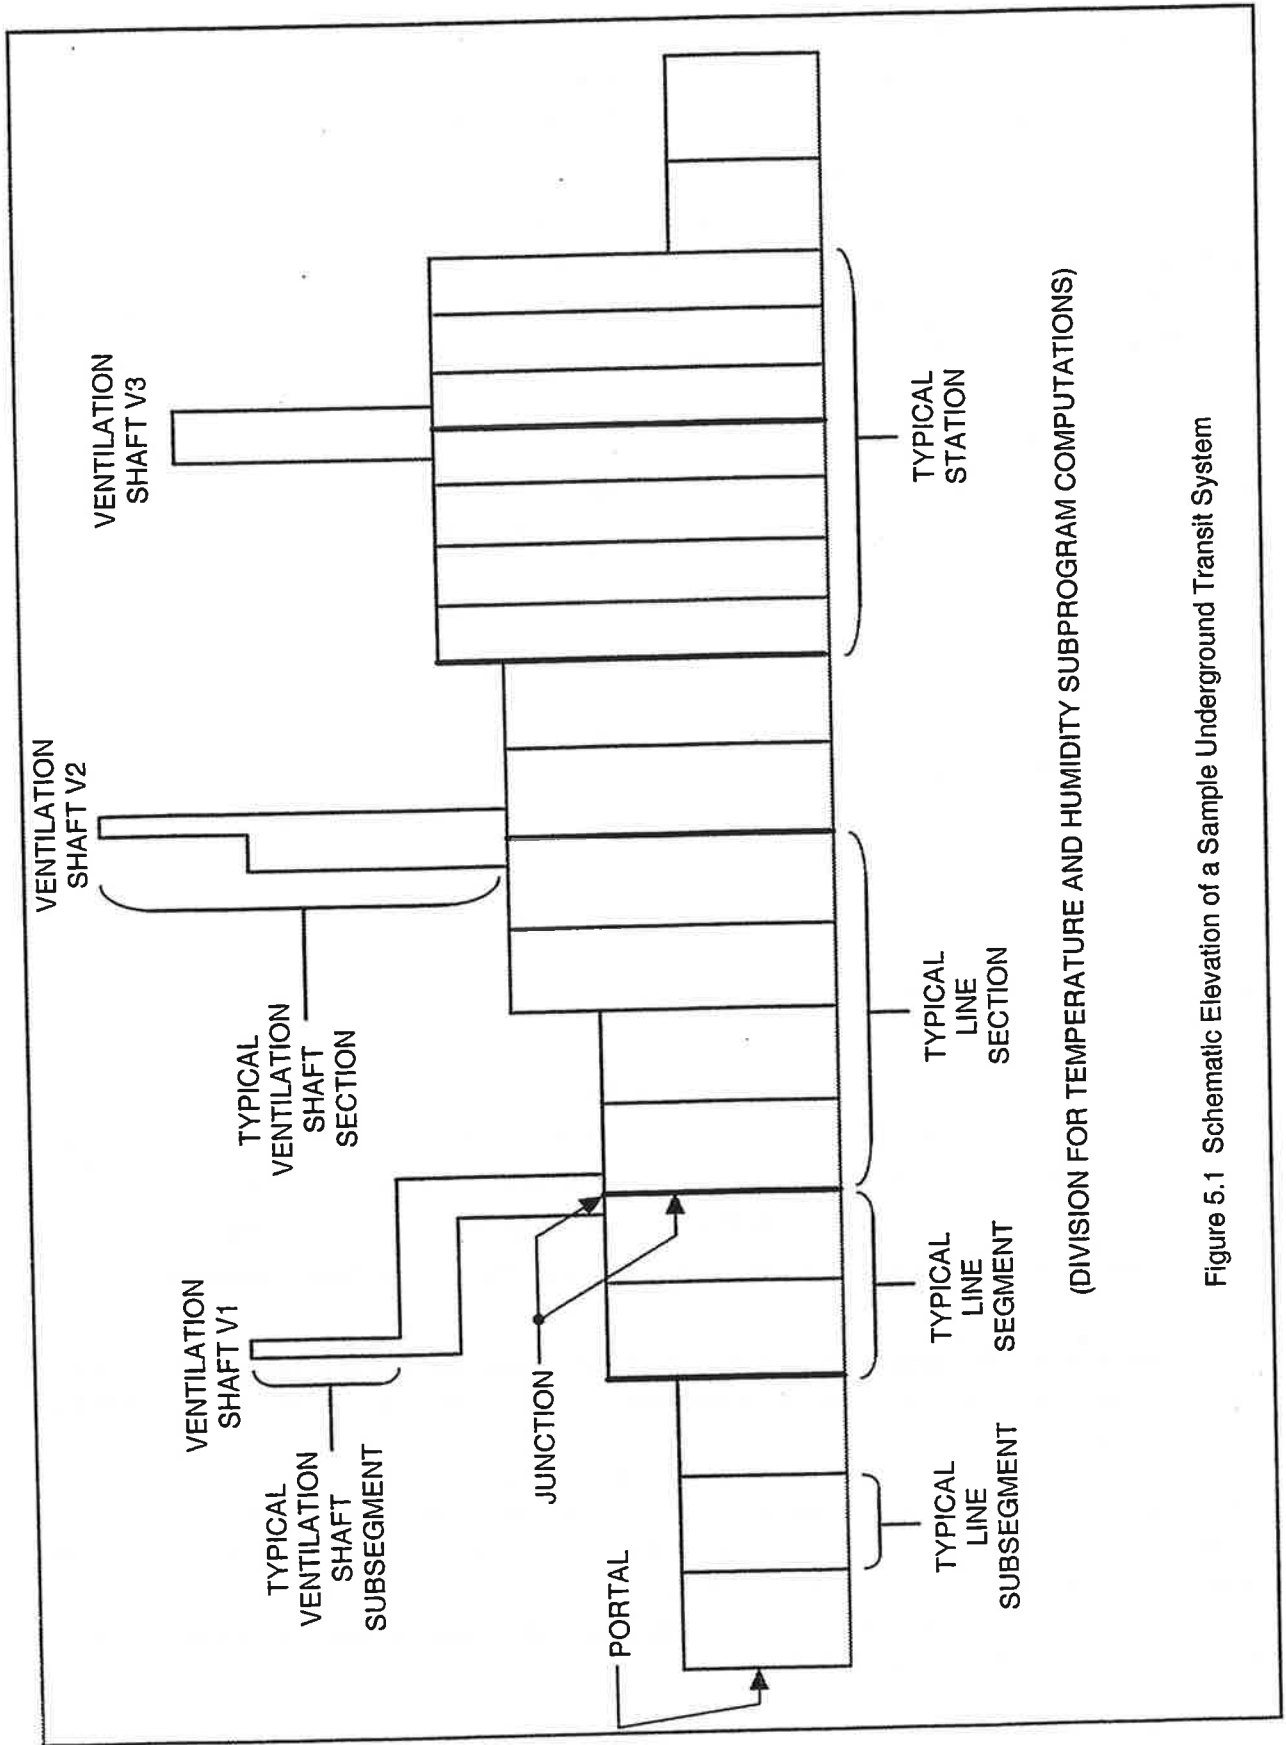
Schematic Elevation of a Sample Underground Transit System
